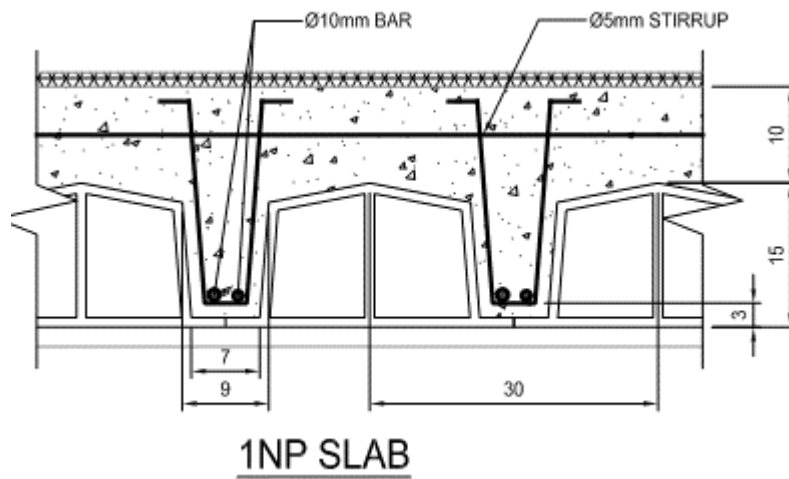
Level 1NP Slab Cross Section with dimensions in centimeters [16]
